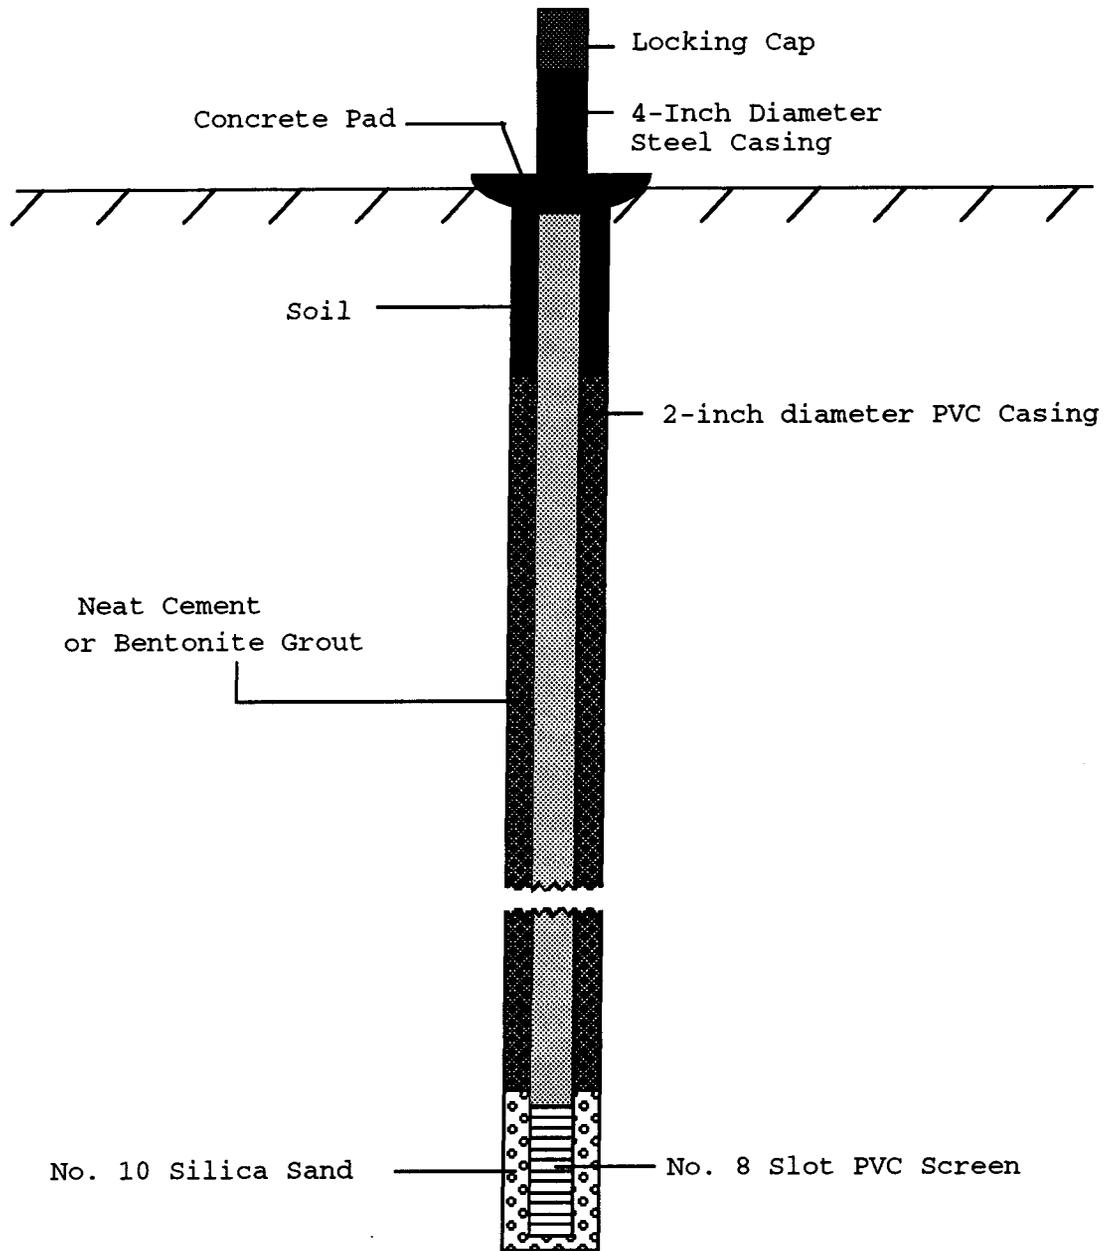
Construction design used for monitoring wells installed at the Adams County landfill.
